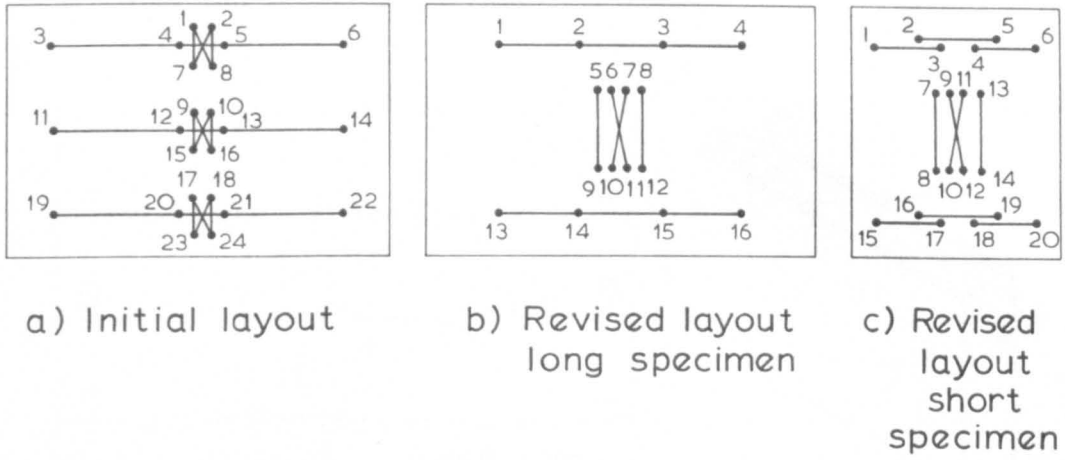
LAYOUT OF DEMEC POINTS.
